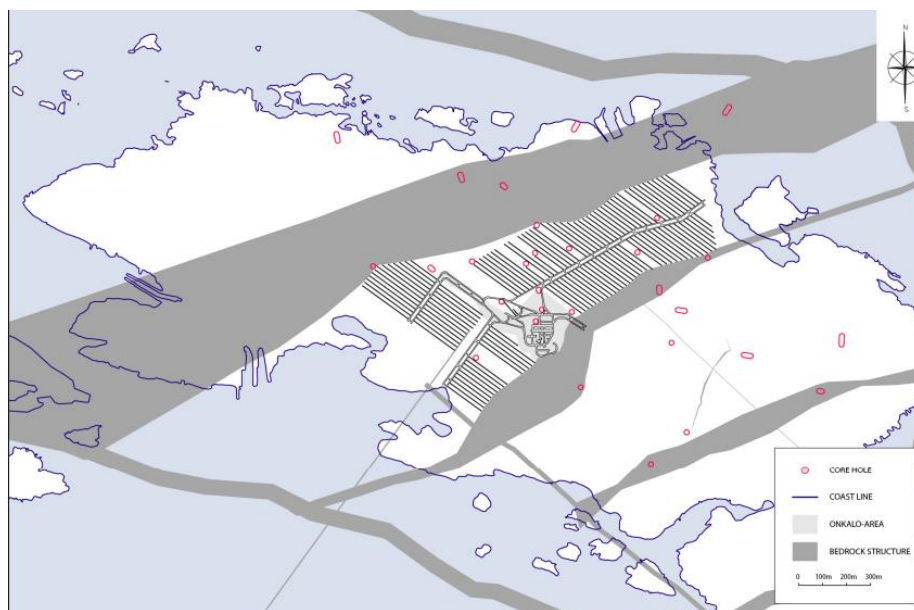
Layout of the underground facility (Saarnio et al., 2013)
